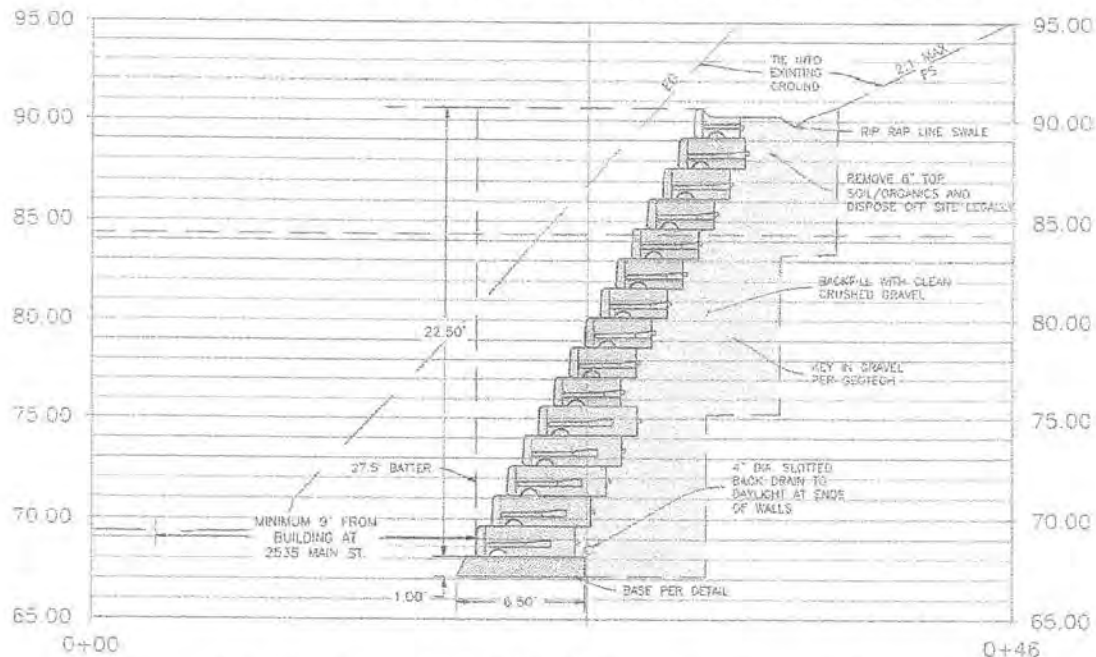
22.5' Redi-Rock wall with 9' offset and matching top of failure slope.
